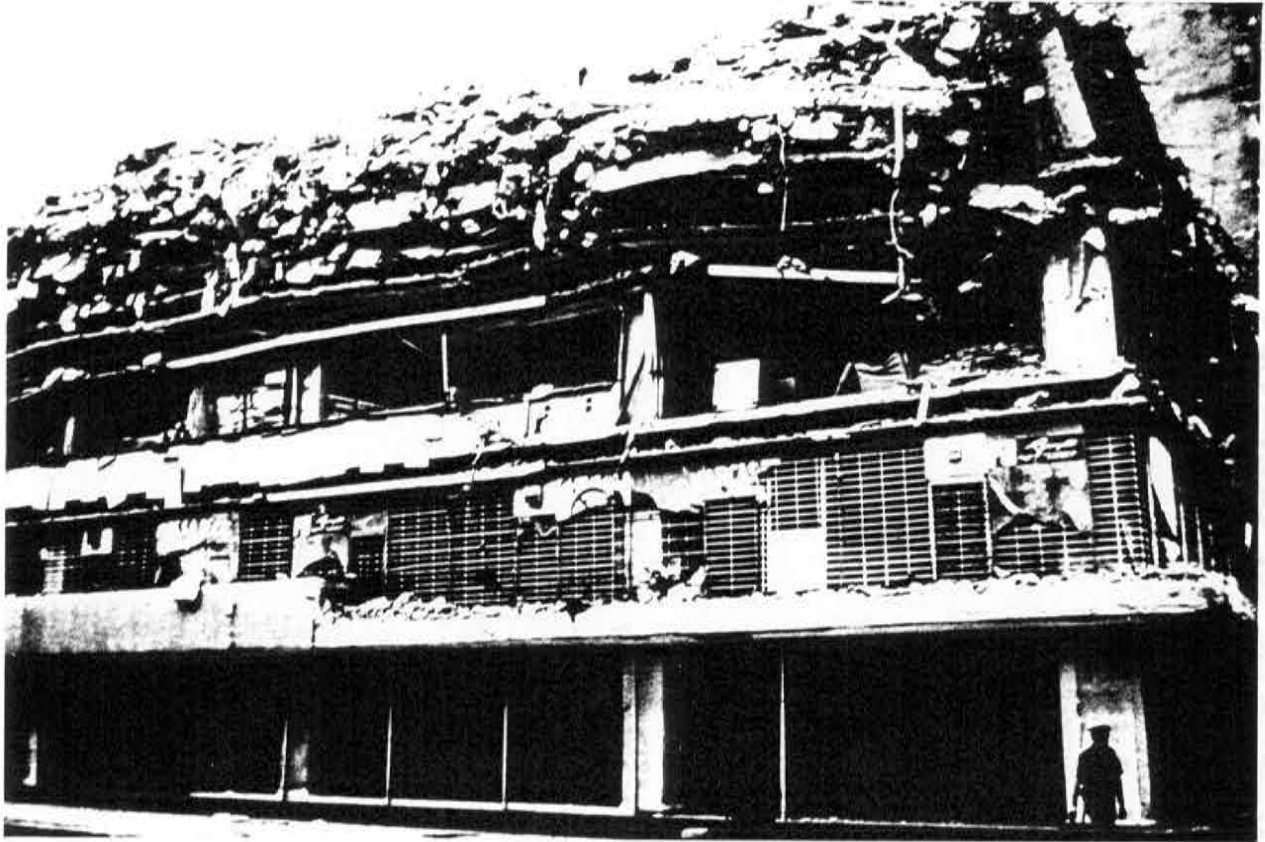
Collapse of Top Storeys of Reinforced Concrete Flat Plate Structure
